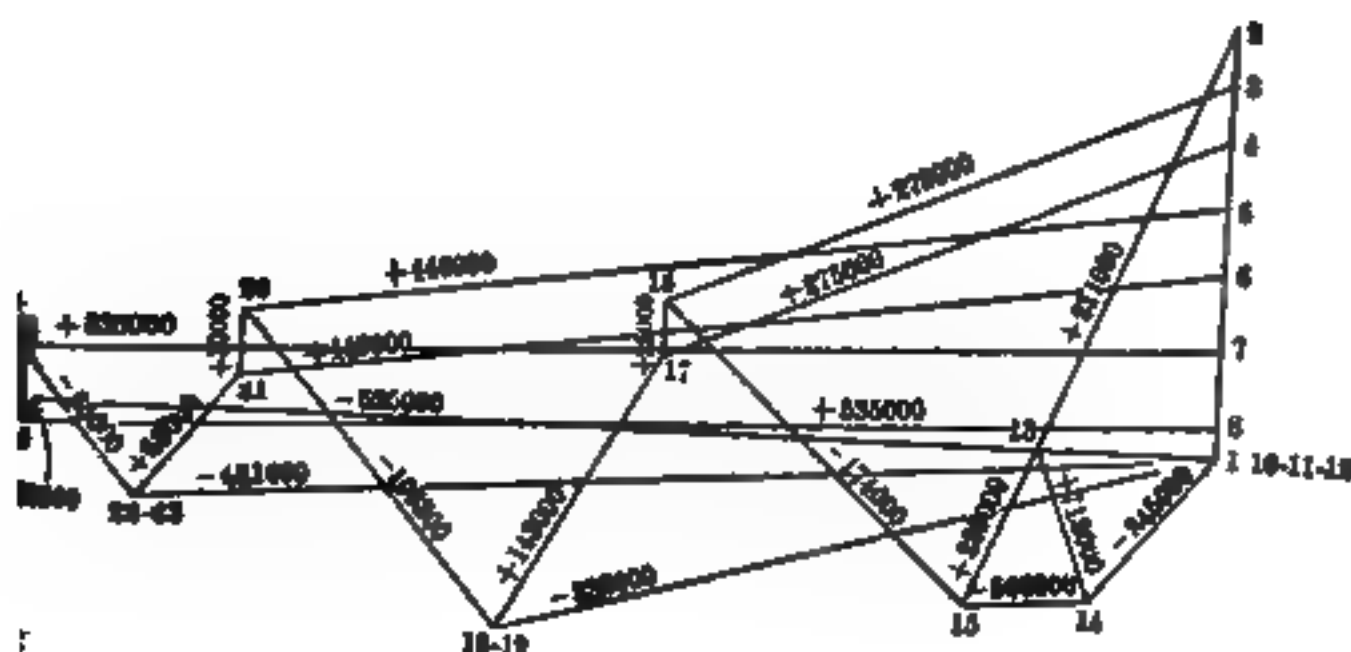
A. Live Stock Pavilion, Chicago, Ill. Stress-diagram for Truss
